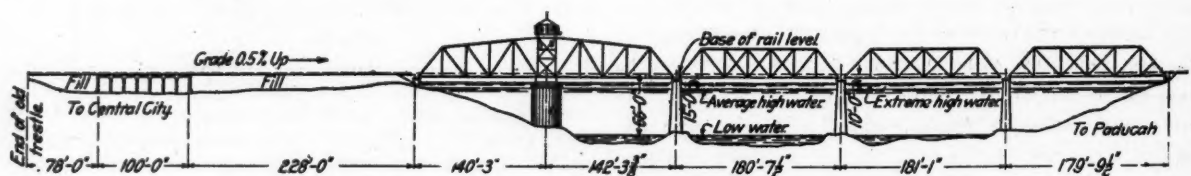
General Elevation, Cumberland River Bridge, I. C. R. R.
